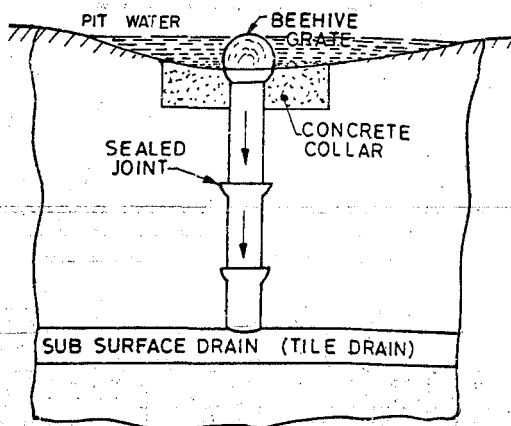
surface inlet draining the surface water into a tile drain.
